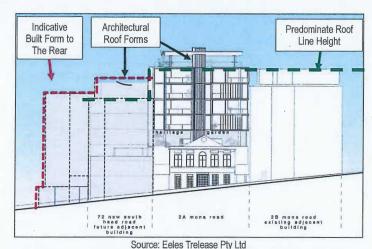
Potential Proposed Building in the Mona Road Streetscape
